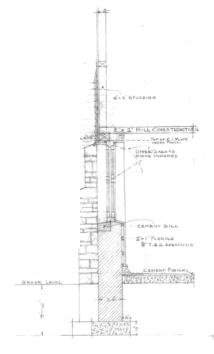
A wall section by Brown and Vallance Architects: Stone pilasters thicken towards the base .
